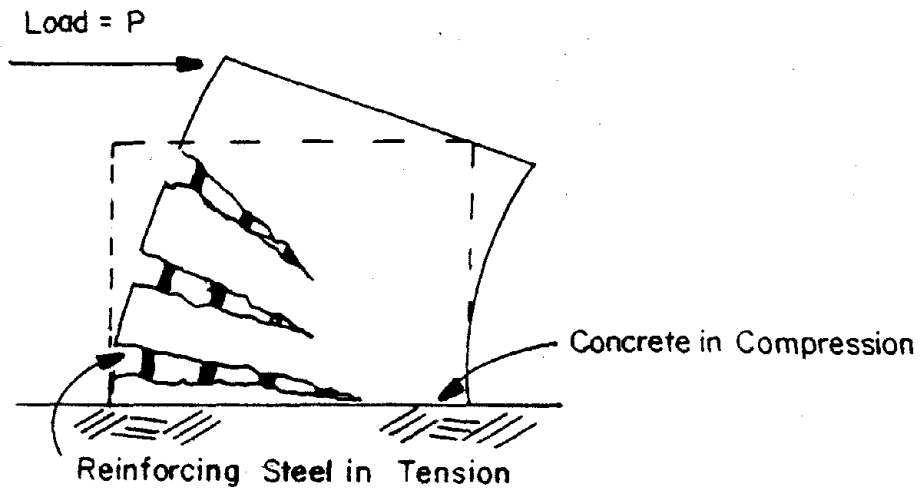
Deformation of a Loaded Shear Wall Due to Bending
